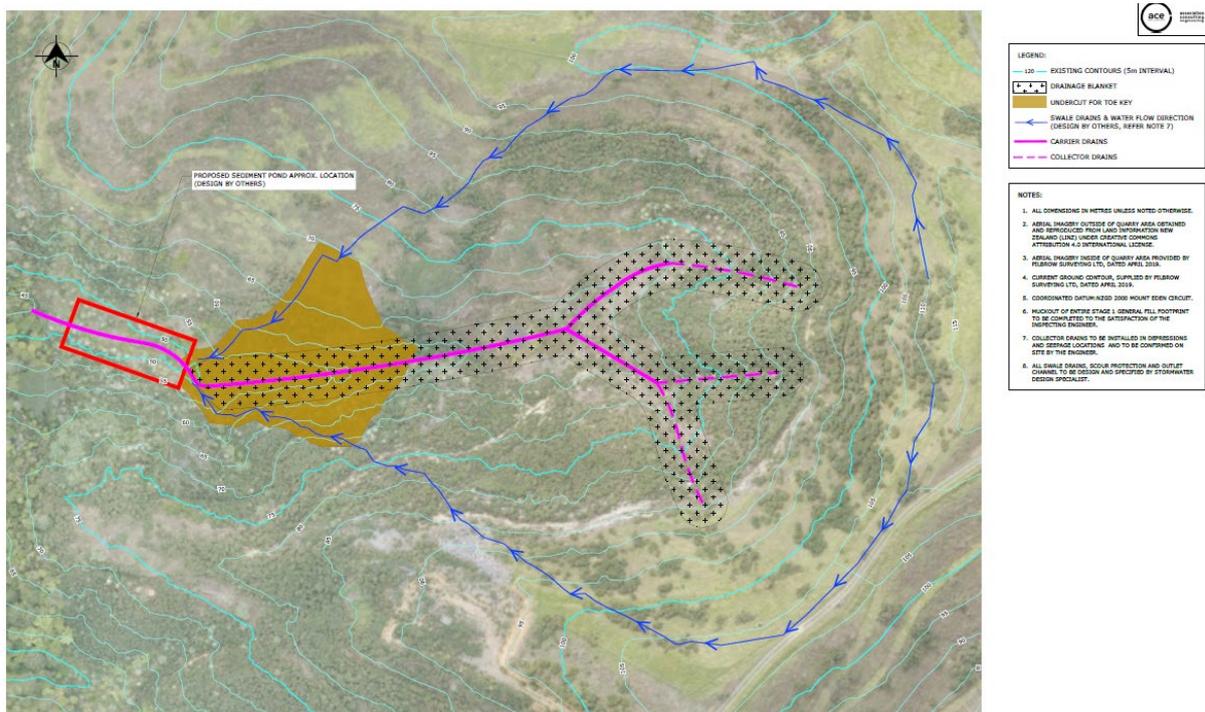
Drawing 2325-23-04 Rev A 'Underfill Drainage Plan' Source: Gaia Report on FA2 (Appendix 8)
